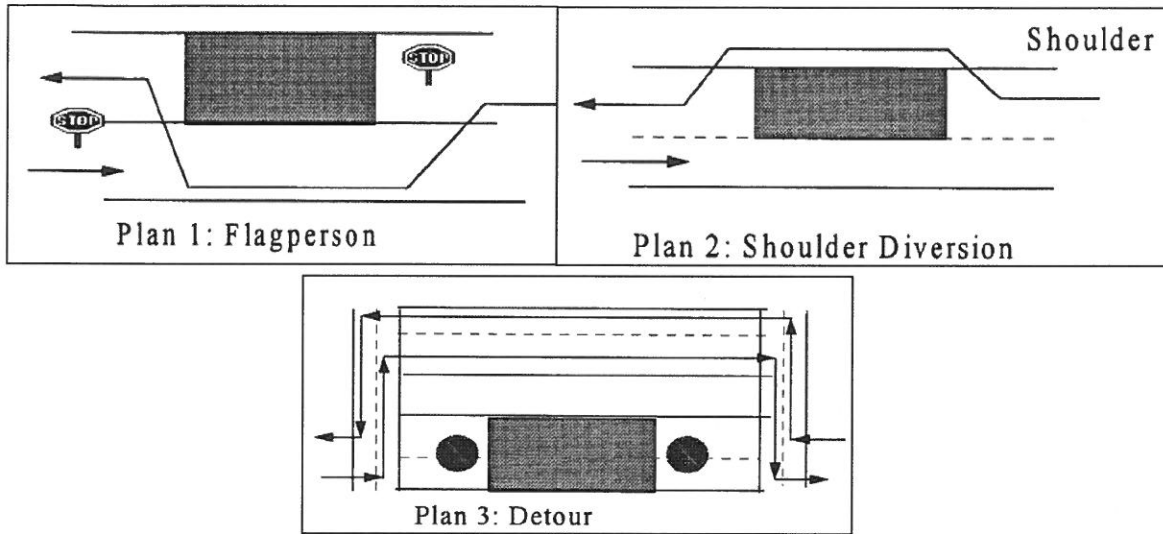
Traffic Control Plans, source Tighe *et. al* [9]
